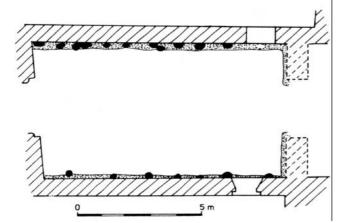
Hadstock: plan of the nave, showing postholes used for supporting temporary wall shuttering; note that these holes pierce the top of the hoggin foundation (stippled)
